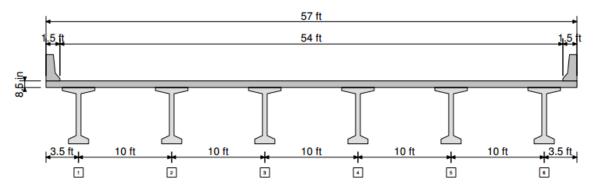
Analysis Bridge Geometry with 10-ft Girder Spacing
